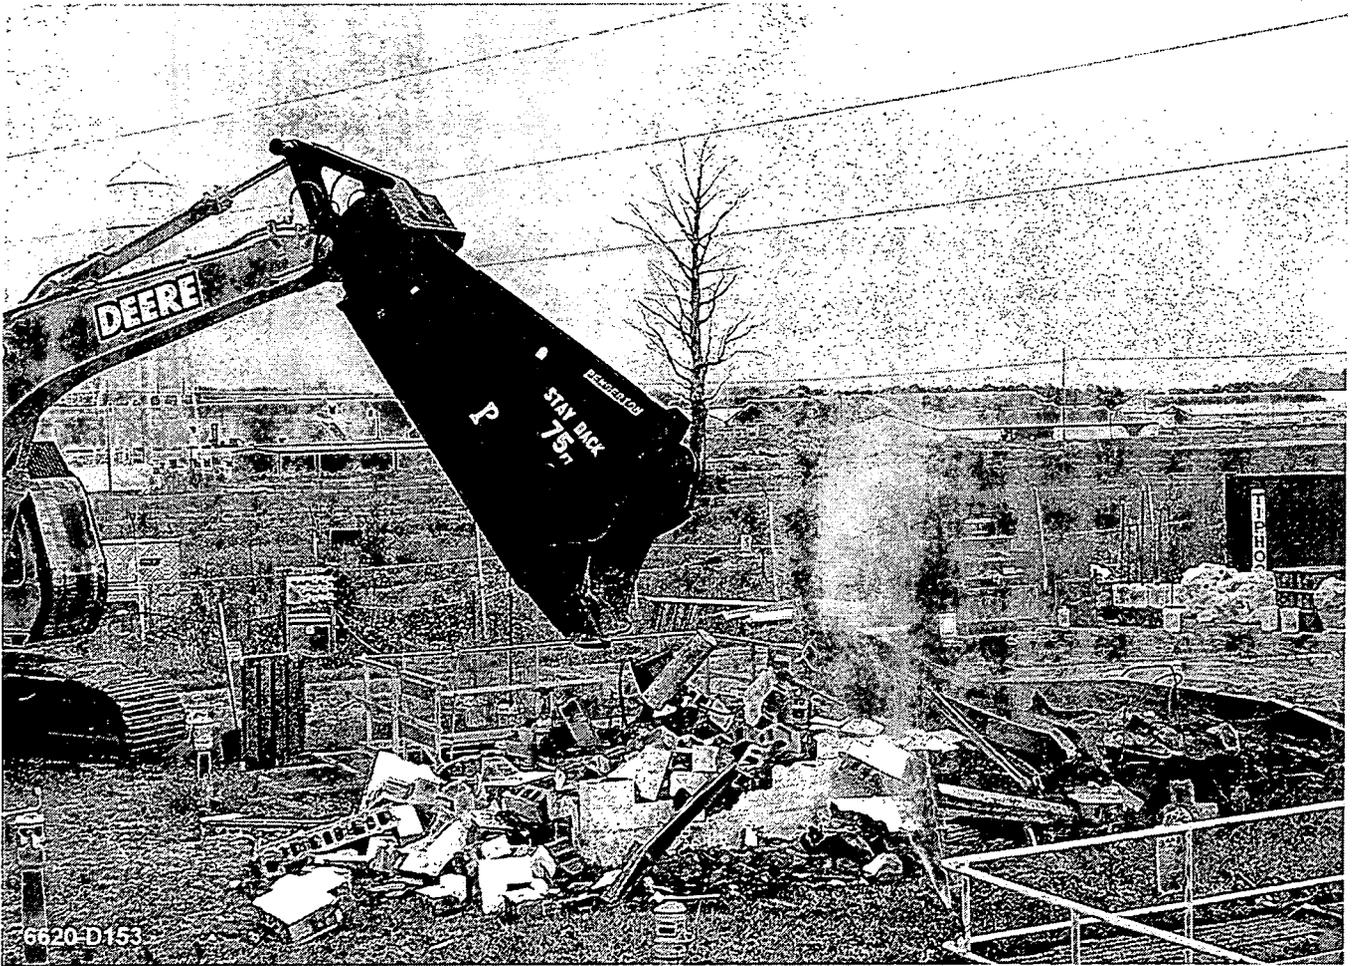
Structural Dismantlement of Chlorination Building (25A)
